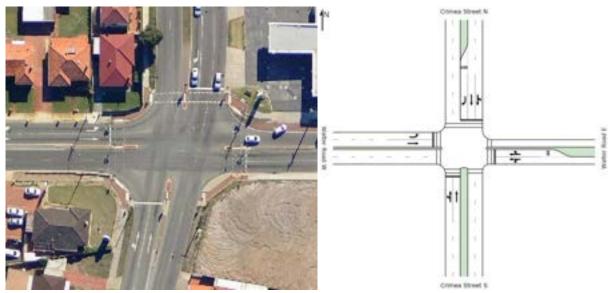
Walter Road/Crimea Street Intersection – Existing Geometry
